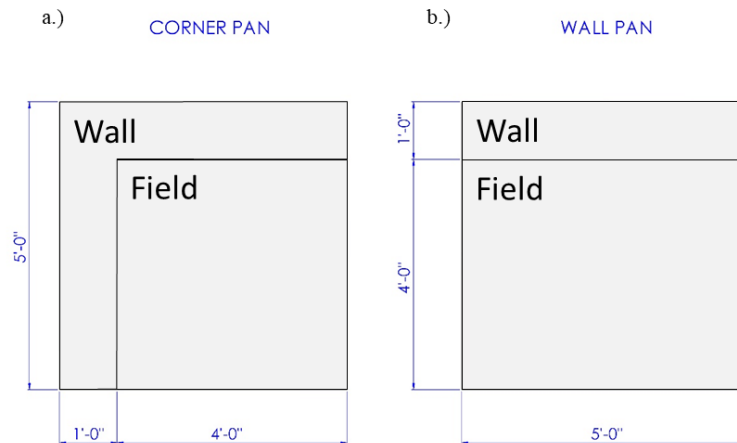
Water-filled pan dimensions and sections where a.) is the pan at the re-entrant corner and b.) is the pan placed along the flat wall (WP 1 and WP 2).
